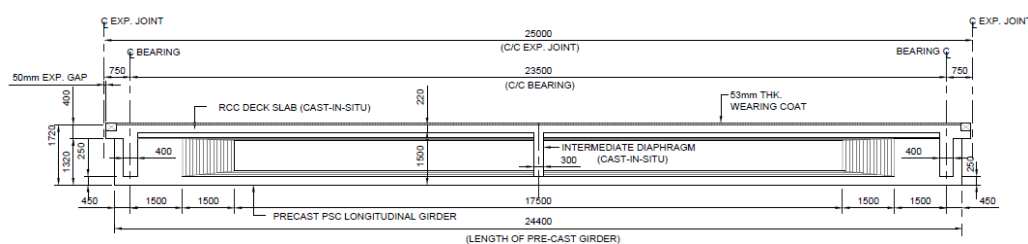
1 Elevation of 25m span OC post tensioned I girder
